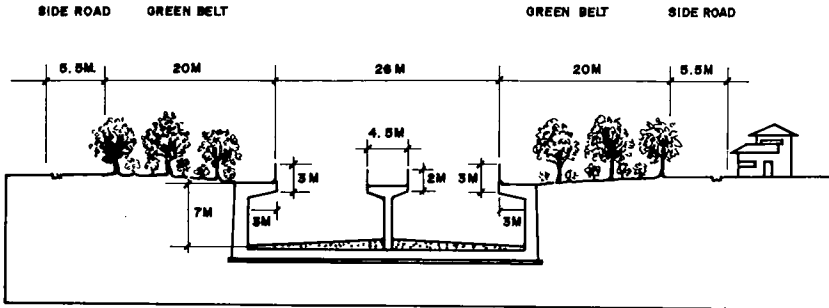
TYPICAL CROSS SECTIONAL STRUCTURE OF THE JOBAN EXPRESSWAY
